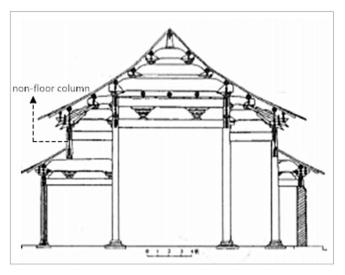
The section of the Dacheng Hall (Shichao Lin)
